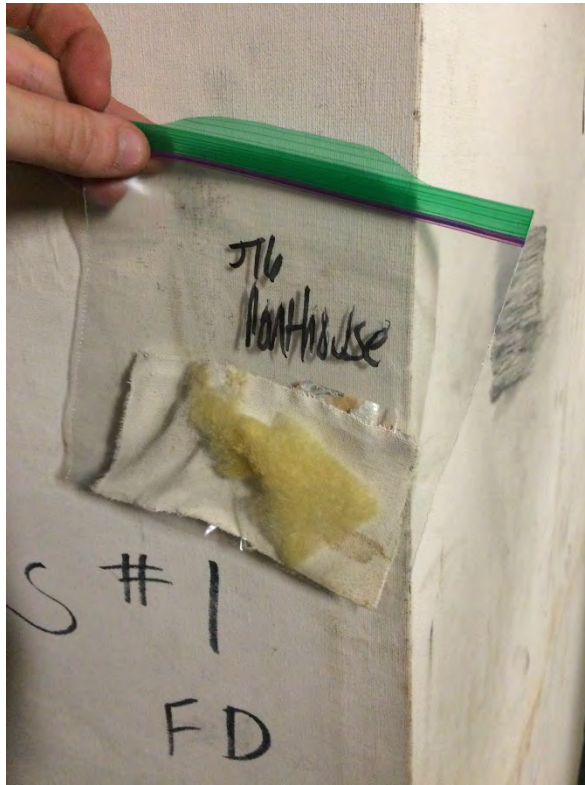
Asbestos sample A38 and A39, ductwork wrap and fibreglass insulation collected from penthouse in Pod J16. No asbestos detected.
